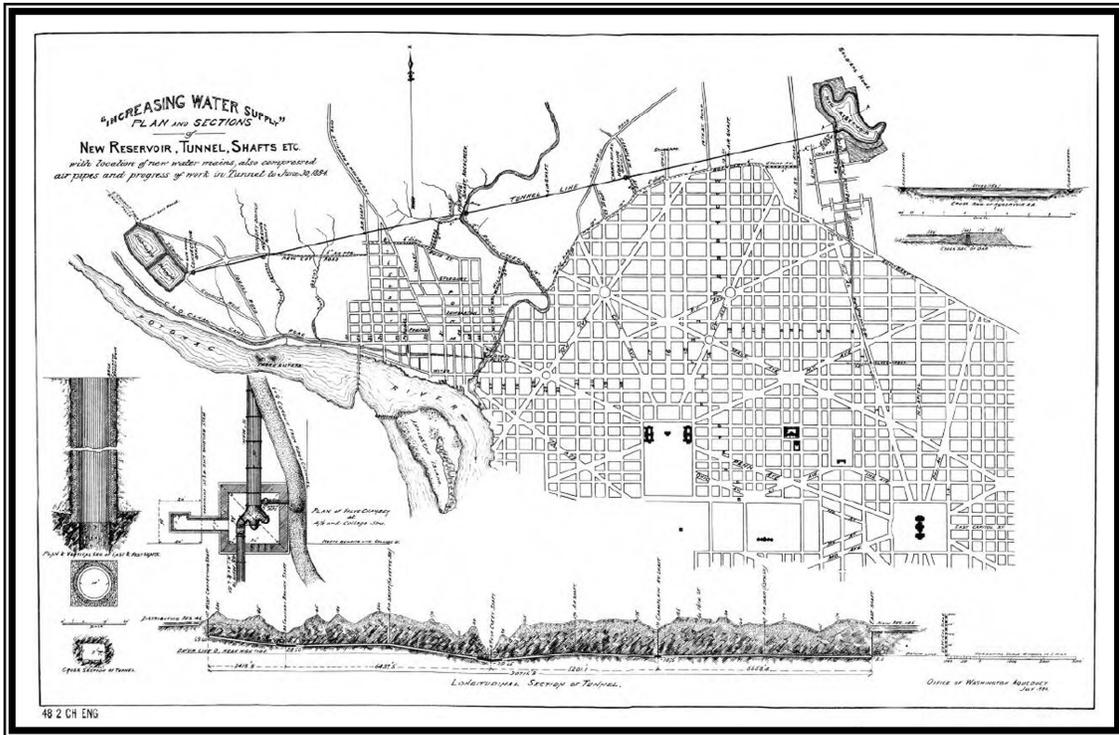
The Plan of the New Washington City Tunnel, 1883, Corps of Engineers
